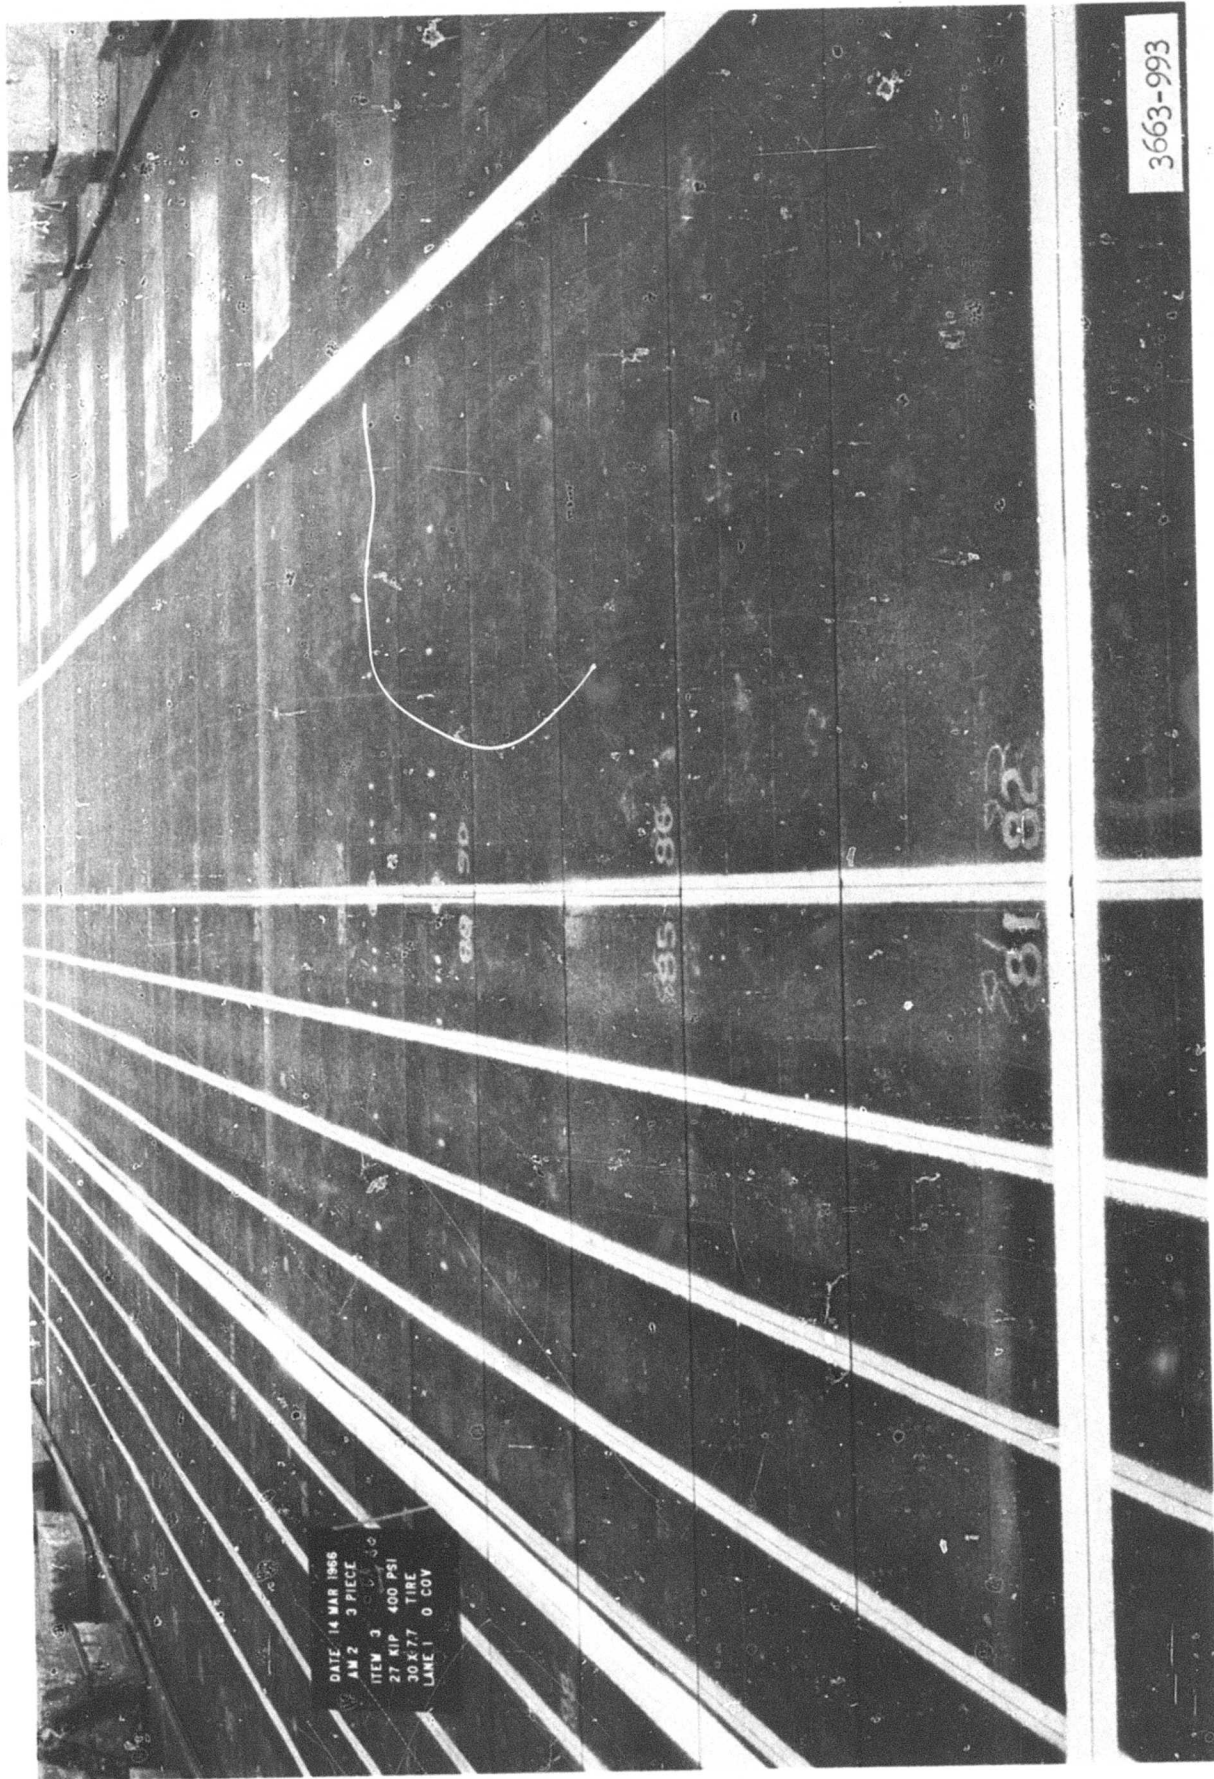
End-connector weld crack in plank 6, after 20 coverages,
